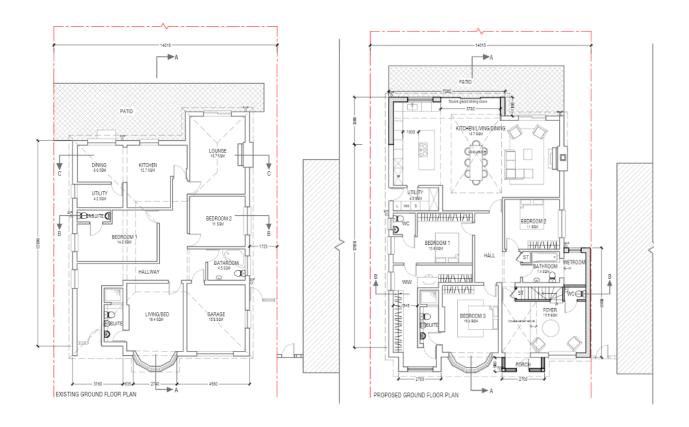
& 13 – Existing (left) and Proposed (right) ground floor plan
